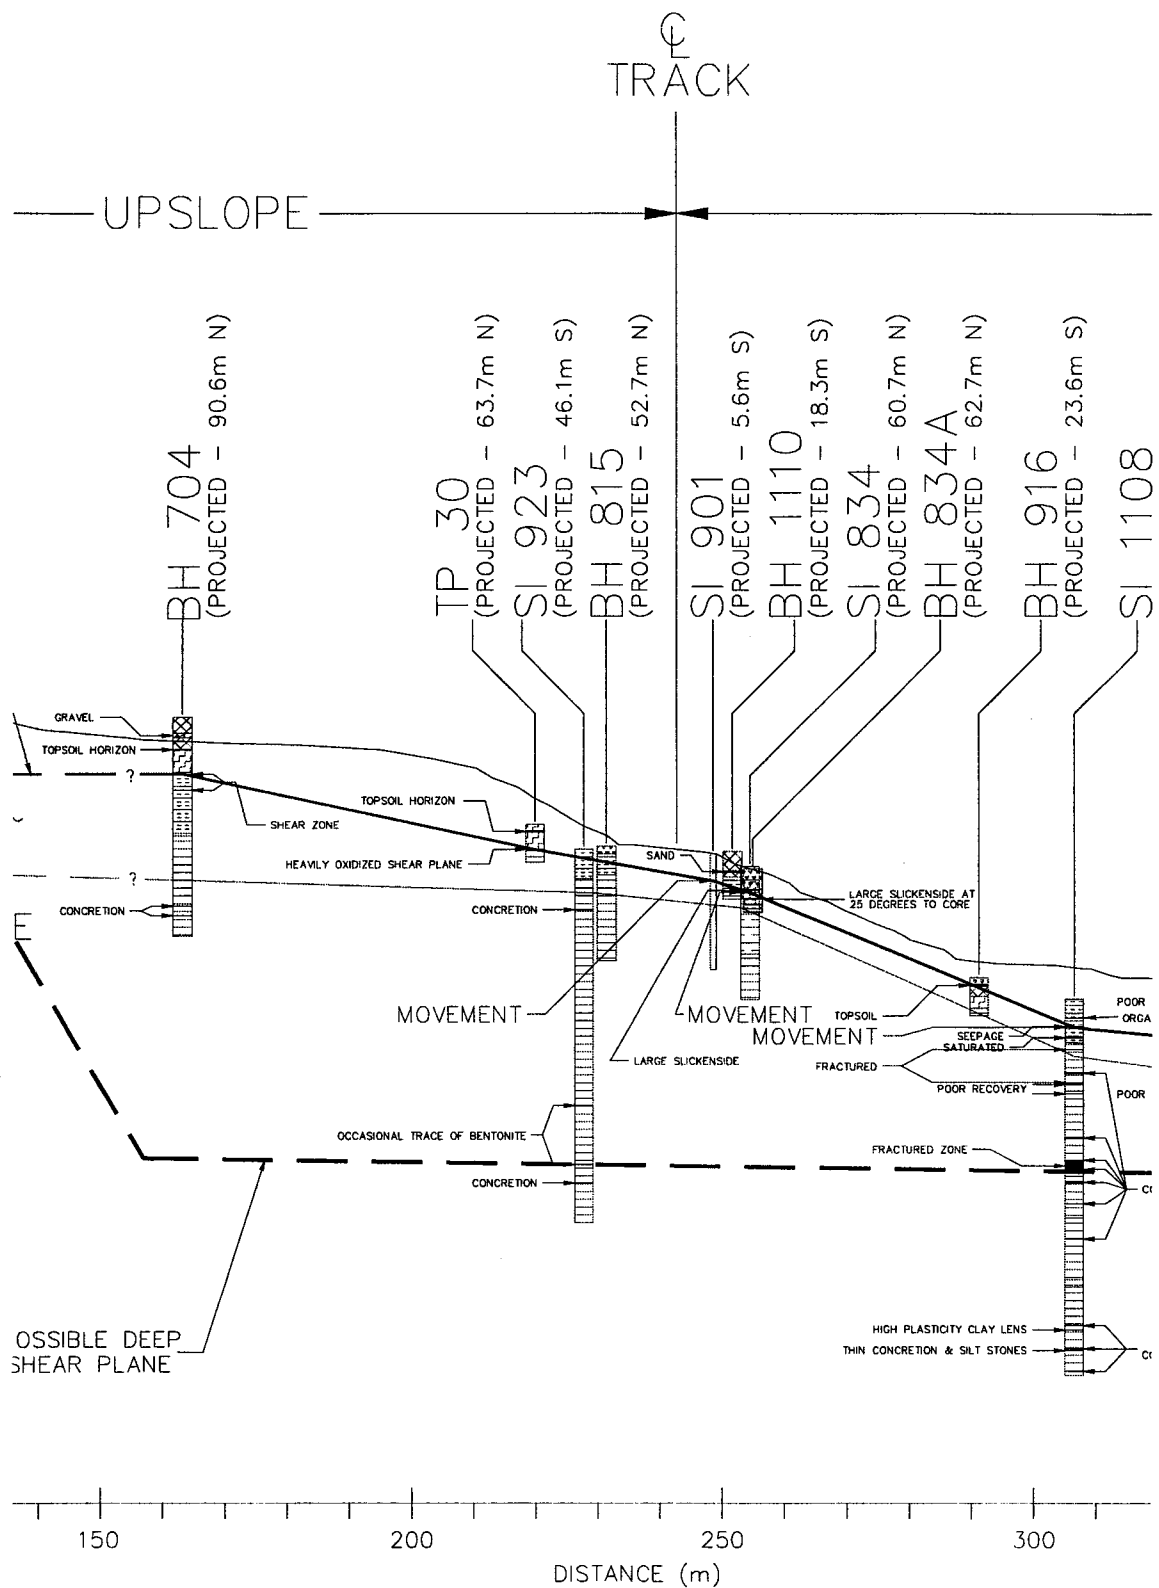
Enlarged section locating possible shear surfaces (cont.).
